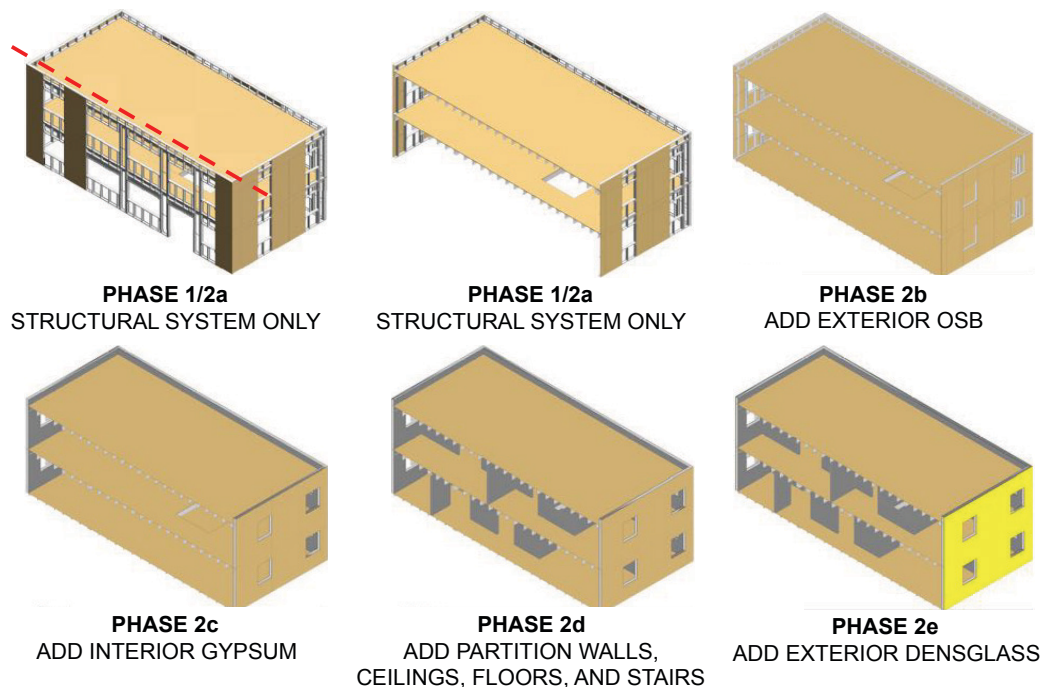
Illustration of construction milestones within Phase 2 testing, shown via cross Section views of building specimens (dashed line indicates location of cross Section) (Schafer 2015)
